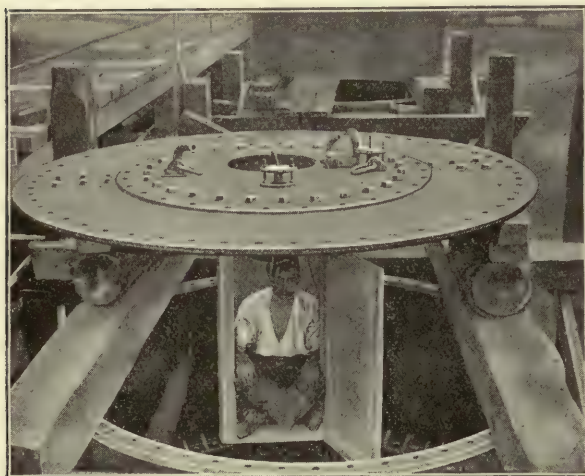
AN AIR-LOCK AT THE TOP OF ONE OF THE EIGHT CYLINDERS SUNK FOR THE FOUNDATIONS OF THE SOUTH TOWER OF THE RUNCORN TRANSPORTER BRIDGE.
